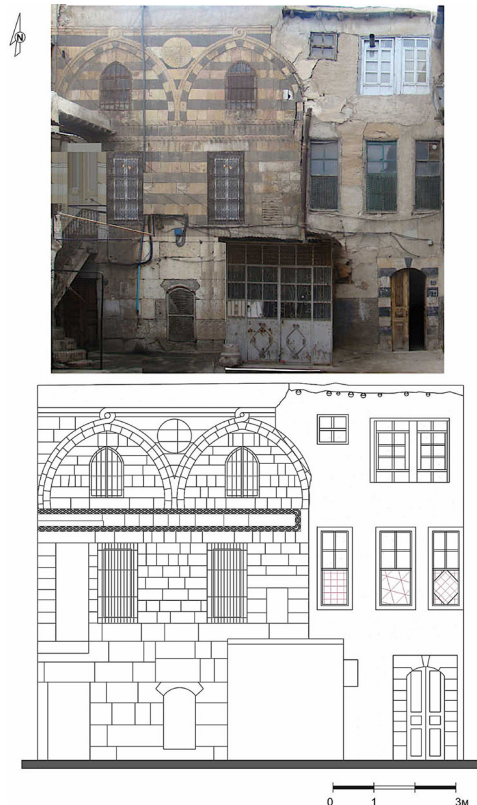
The al-Aglani house: elevation of the interior south facade. Author's photograph and illustration, 2012, CC BY-NC-ND.
